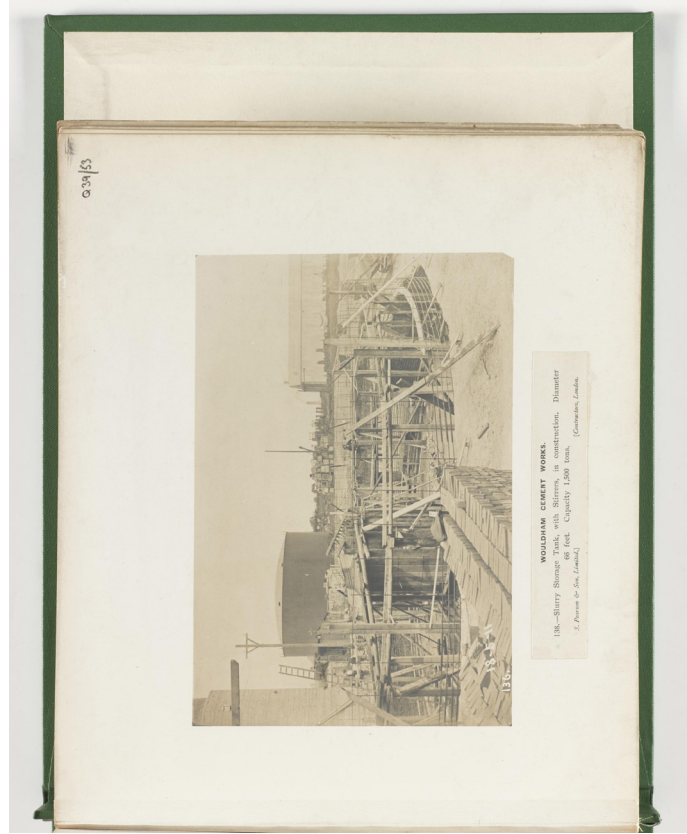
Unknown author, “Slurry storage tank, with stirrers, in construction” 1911
